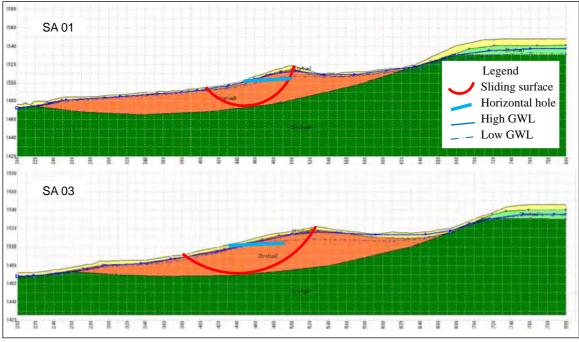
Possible locations of horizontal holes for Arapi site on sections
